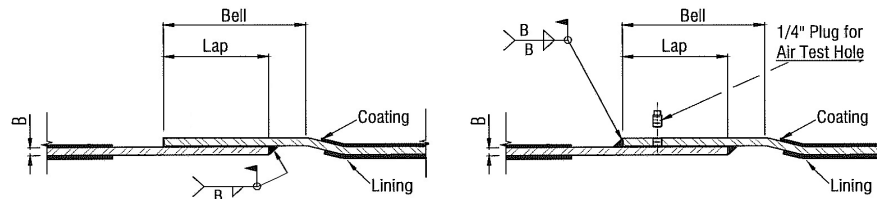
, b: WSP with Single and with Double-Welded Lap Joints
